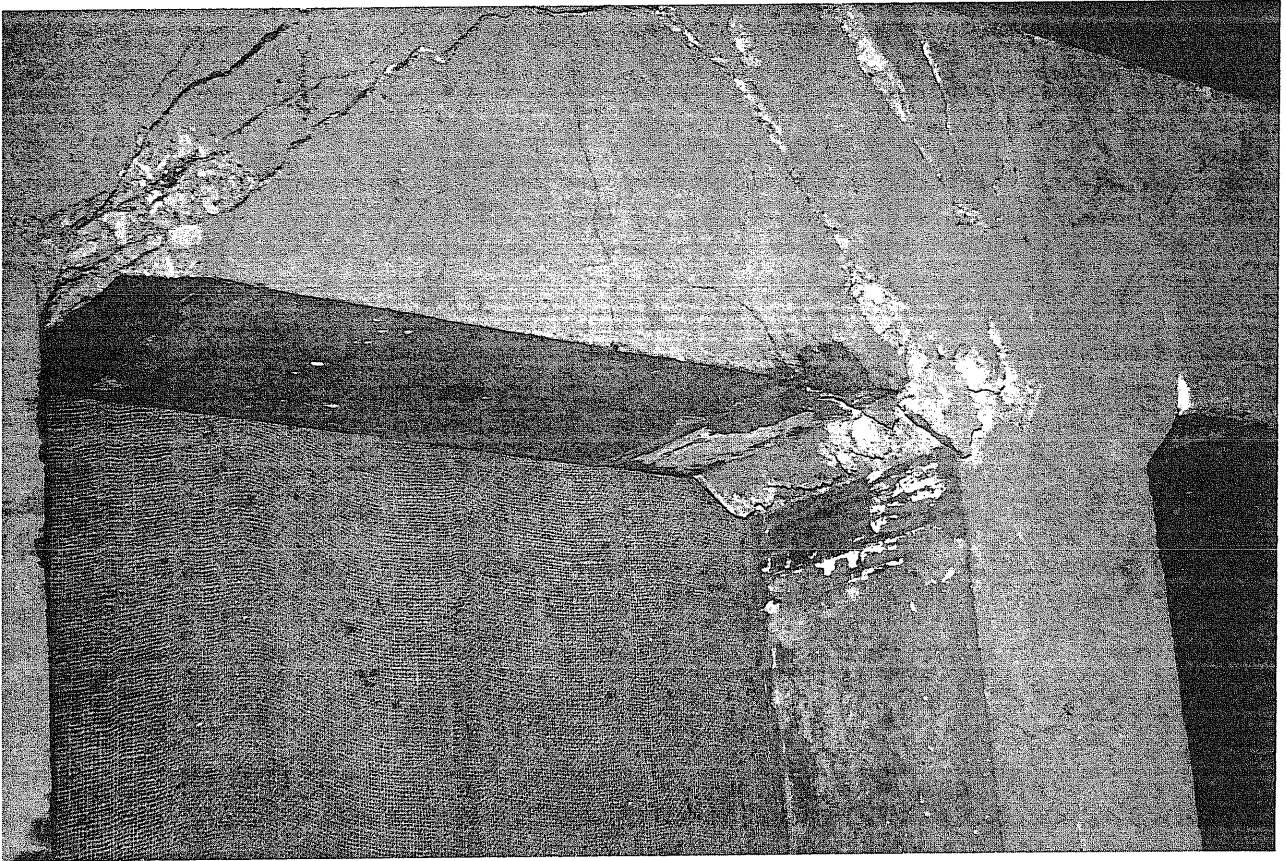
INSIDE FACE OF INTERIOR SPAN, SPECIMEN R1
